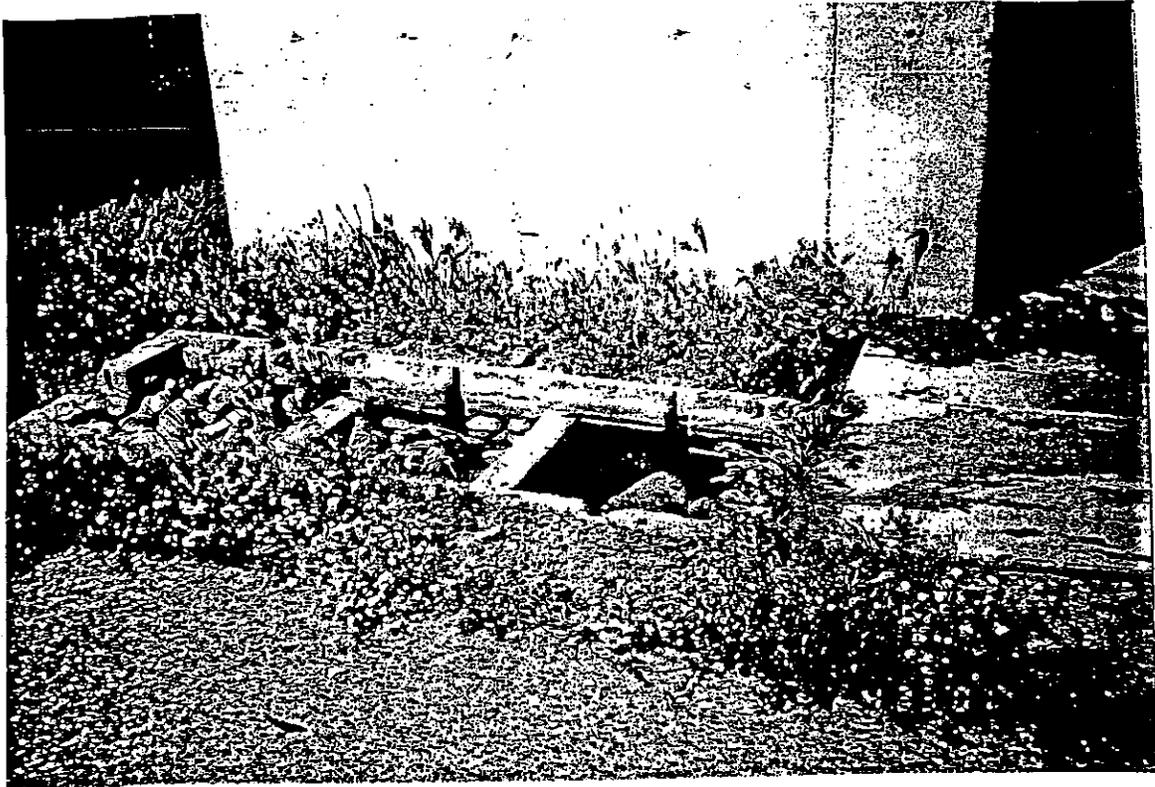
General view of 3-stage, formerly used clarifier at central portion of site.
